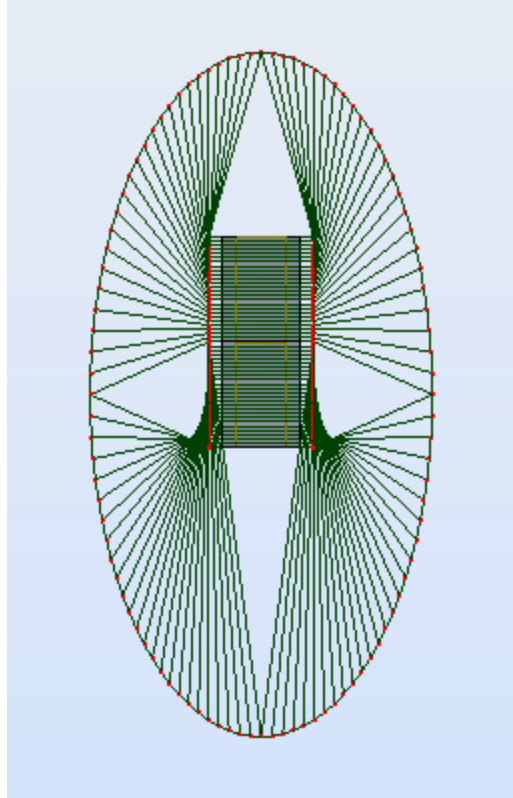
Cross-section of the 65 by 130 foot radius model with the sloped deck.
